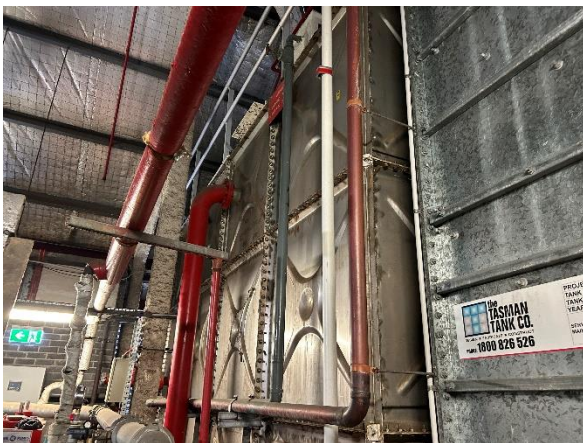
Level B6, parking bays 137 and 138, underground diesel tank.
